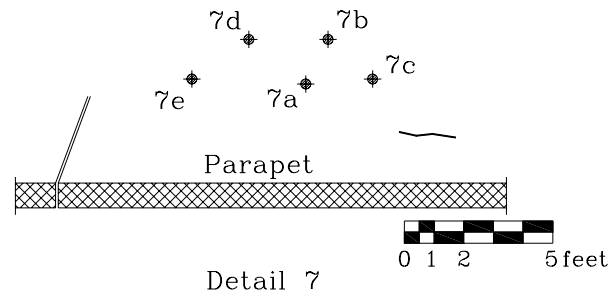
Map of cracks at coring locations for Bridge Deck Number 7 (Structure No. S03-81041)
